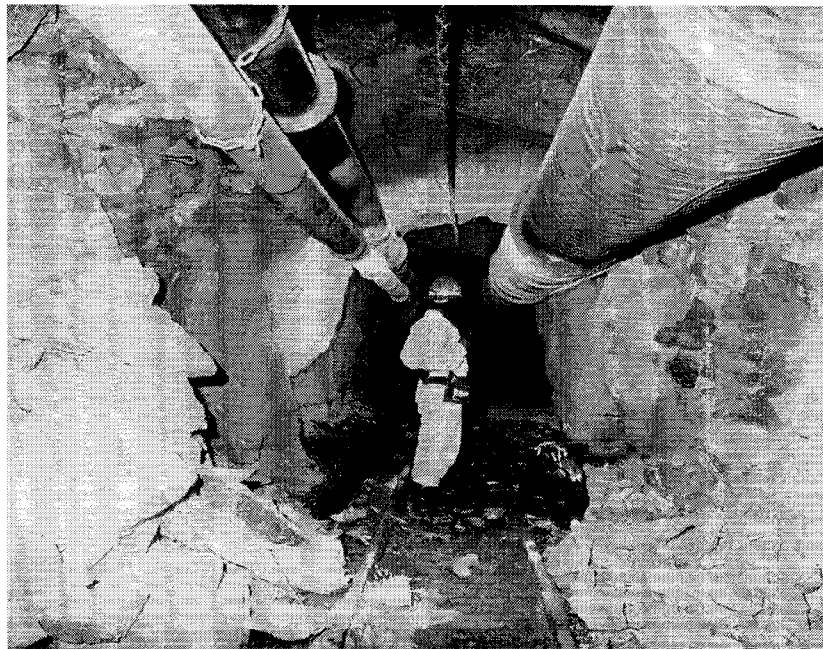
A haulage on 34 level showing the effect of the support system on damage. The section of the tunnel in the foreground was supported only by grouted rebars, and significant damage was sustained. The support system in the section of the tunnel beyond the miner consisted of grouted rebars, mesh, lacing and shotcrete. Damage was negligible.
